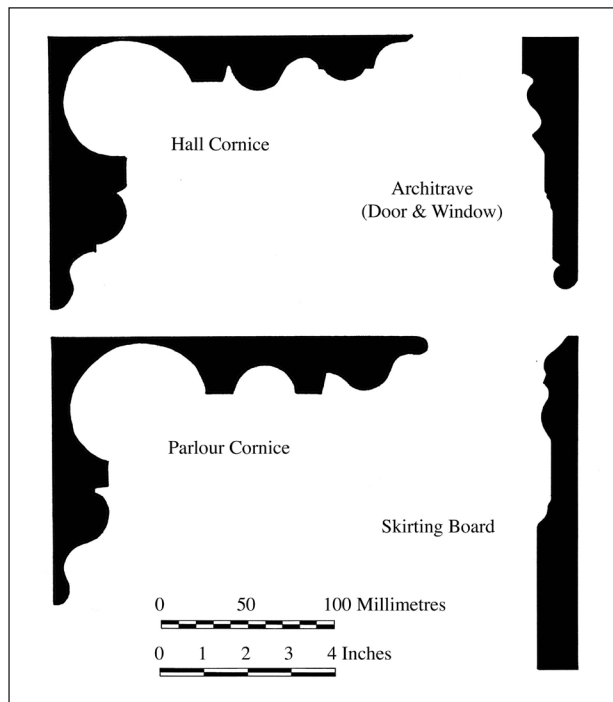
Profiles of original ceiling cornices, door and window architraves, and skirting boards, taken in 2015.
